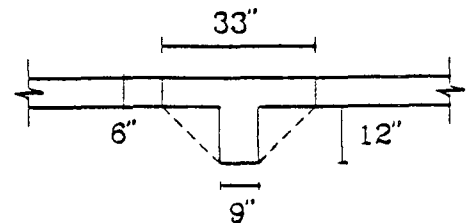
Beam Cross Sections Used for Slab Thickness Calculation.
